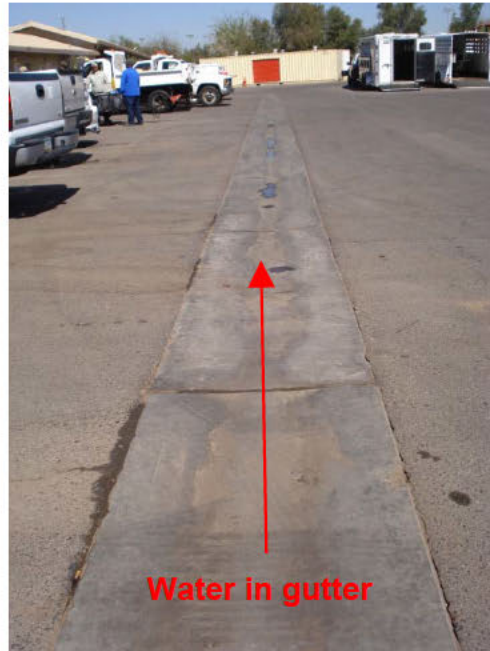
Kiwanis Park Maintenance Facility – View of water in gutter and on pervious area from washing activities.
